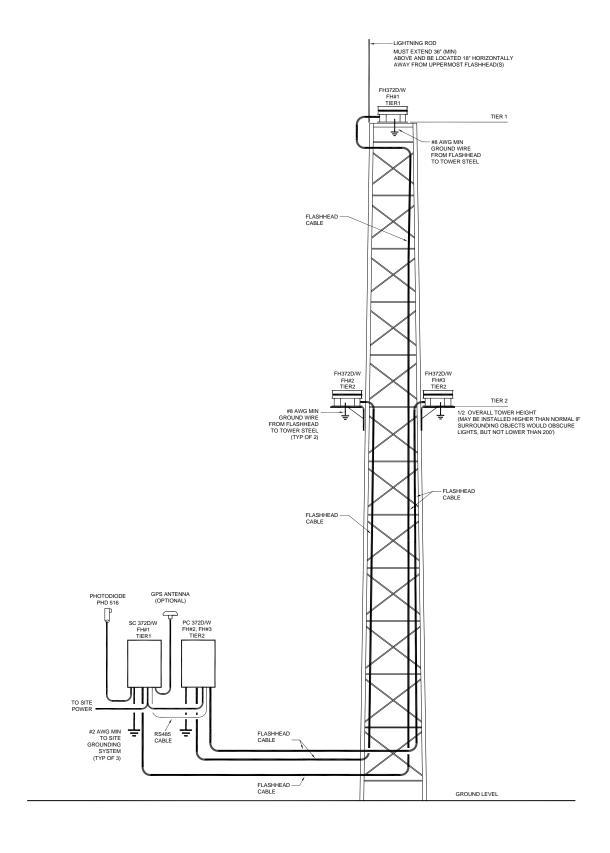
Typical E2/D2 Avian Component Locations (AC 70/7460-1M)
